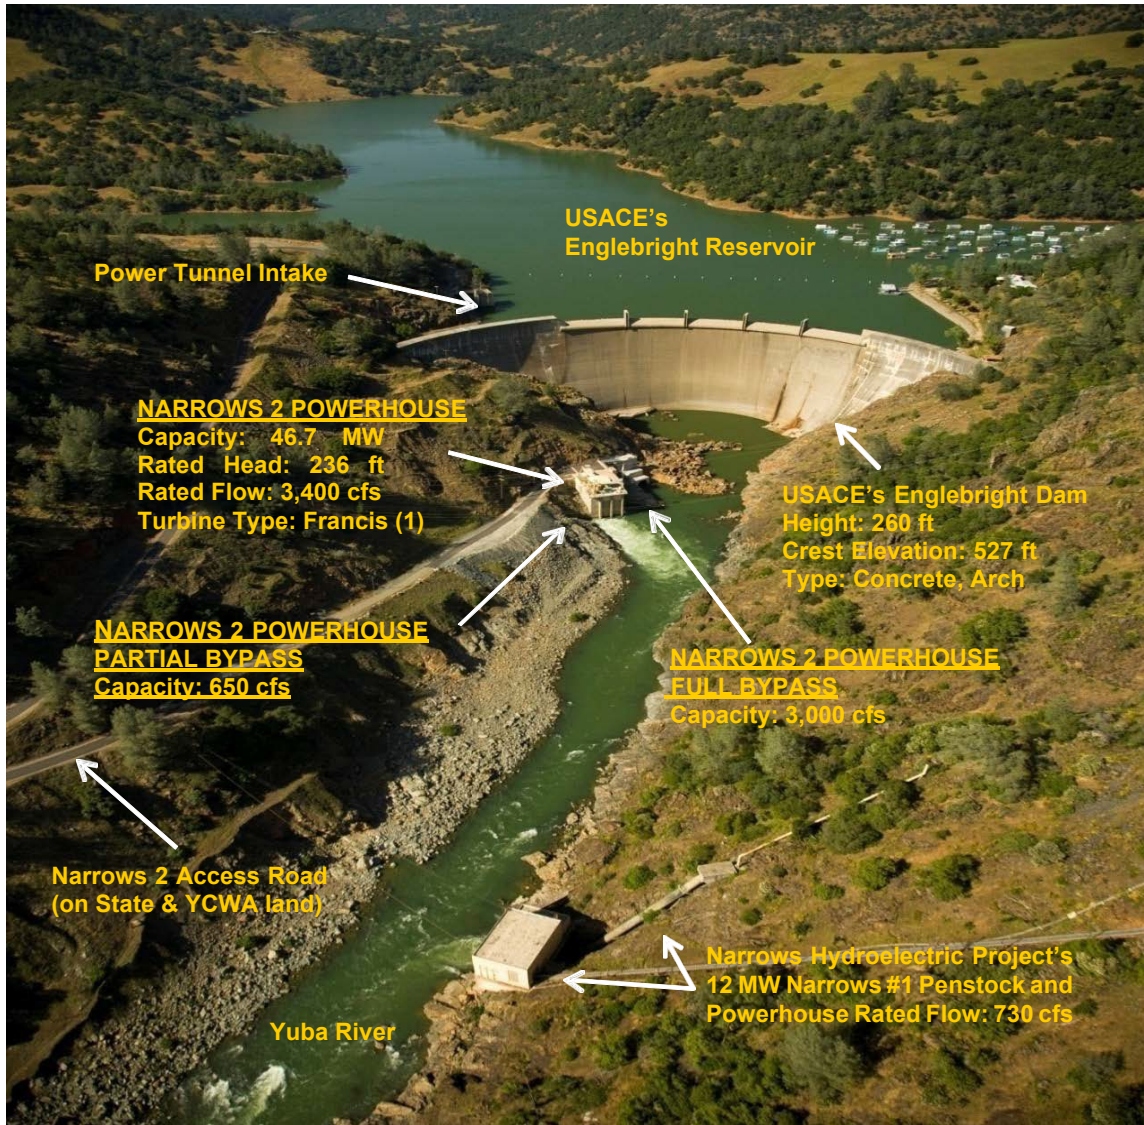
Narrows 2 Development facilities and features. [Note: Englebright Dam, which is a facility of the U.S. Army Corps of Engineers, and YCWA's Narrows Hydroelectric Project, which is a separate FERC-licensed project, also are depicted.]
